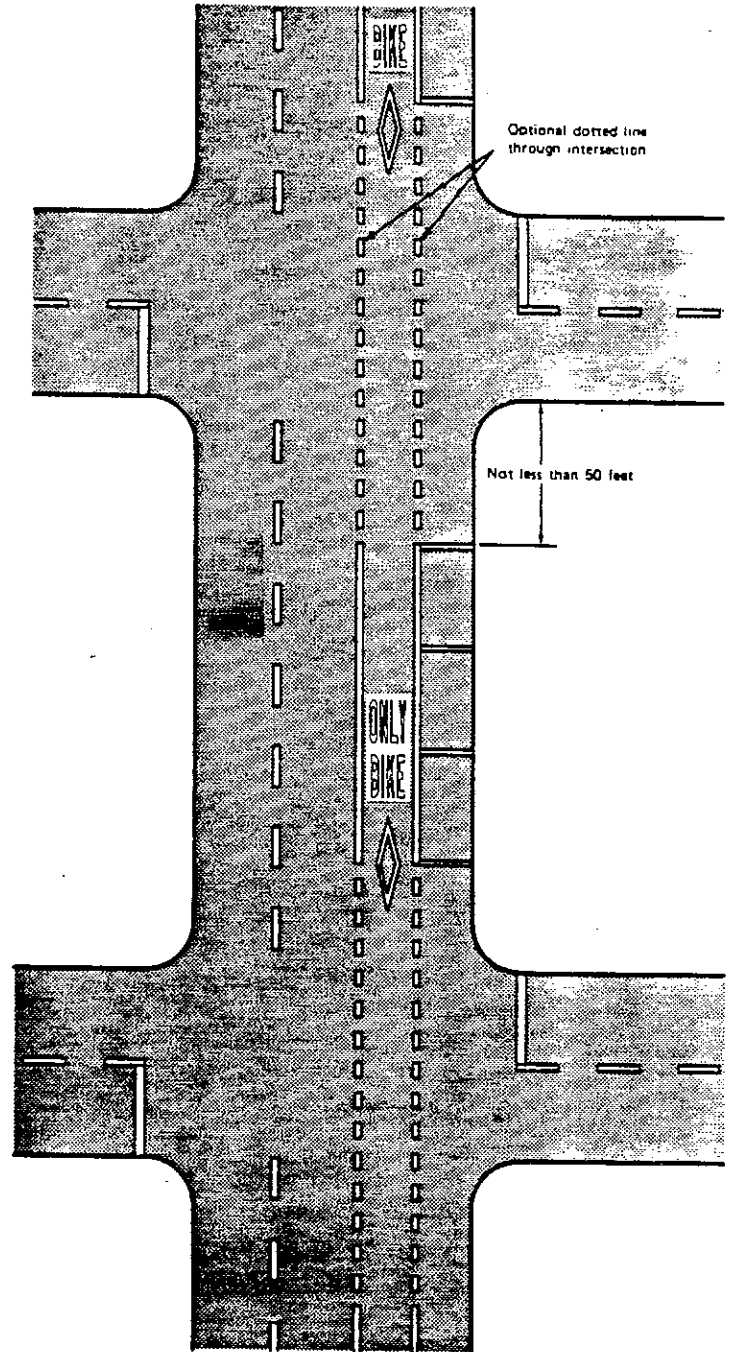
Typical pavement markings—designated bicycle lane, two-way traffic with parking and low right turn volume.
